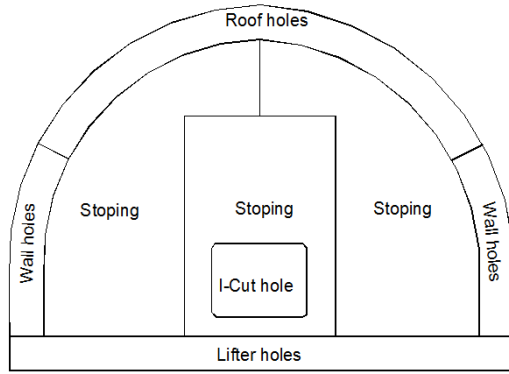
Blasthole groups on the tunnel face in the Croix-Rousse tunnel
